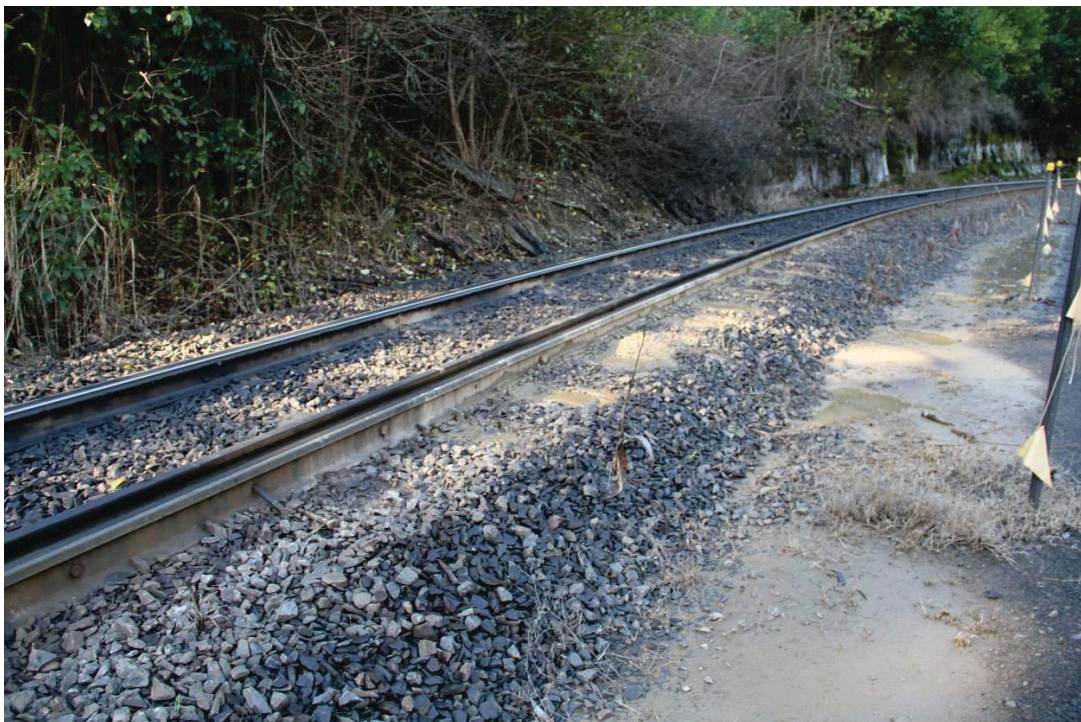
Contaminated ballast and poor drainage causing pooling adjacent to track
